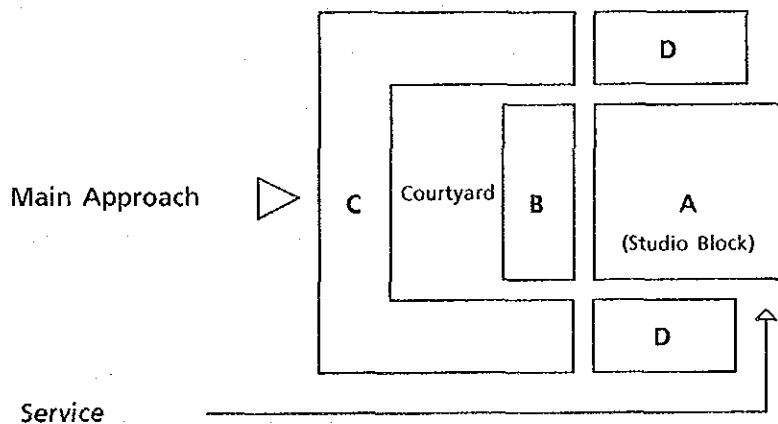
Conceptual Floor Plan for the AV Education Centre
